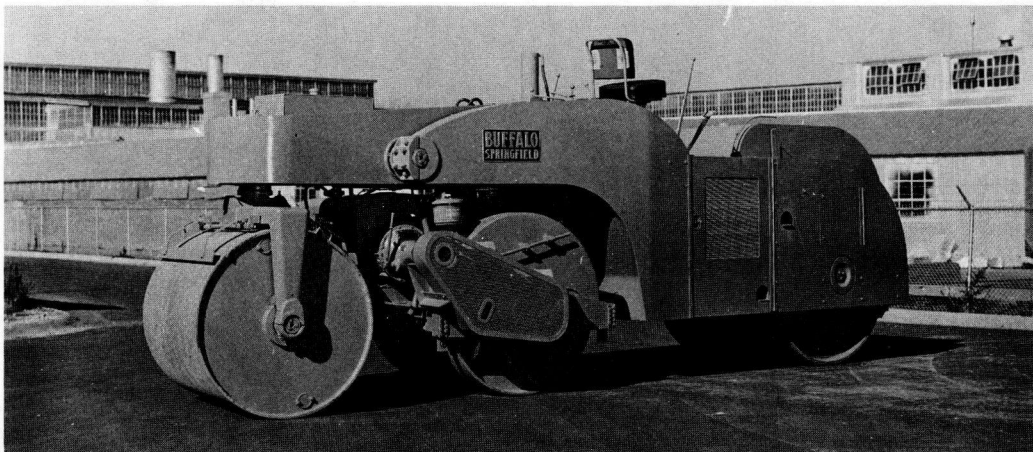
Three-axle tandem roller with center vibratory roll. The center roll can be raised to change the roller to a conventional two-axle tandem roller.
